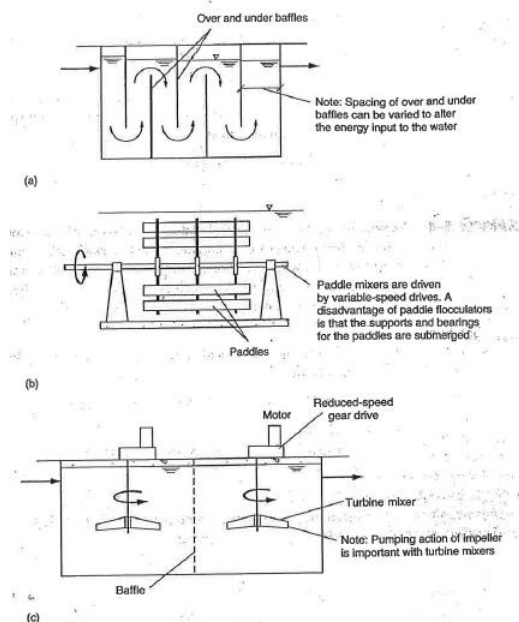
Typical mixers used for flocculation in wastewater treatment facilities (Metcalf and Eddy, 2003).
